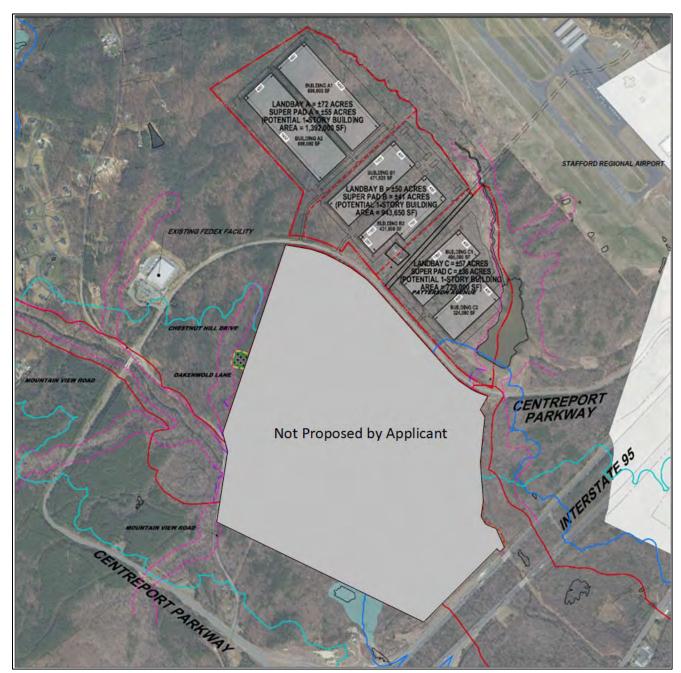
Concept Development Plan (Provided by Bohler Engineering, Dated March 27, 2020)
